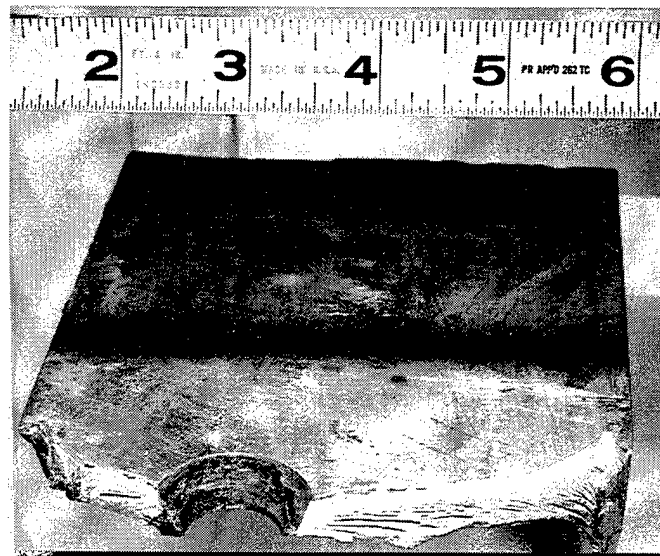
A view of the fractured surfaces of the right section of the broken angle in Figure 20.
